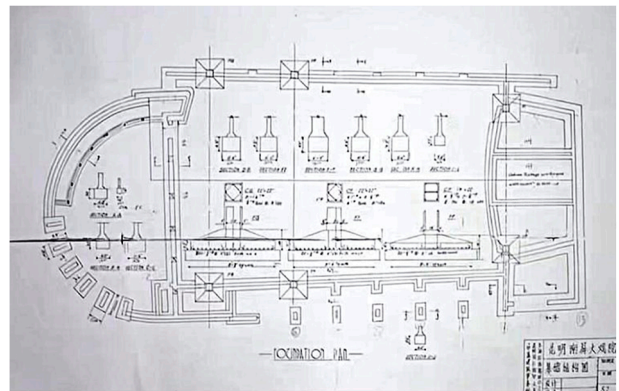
The foundation plan. Source: book launch live stream: *Allied architects at war*.
